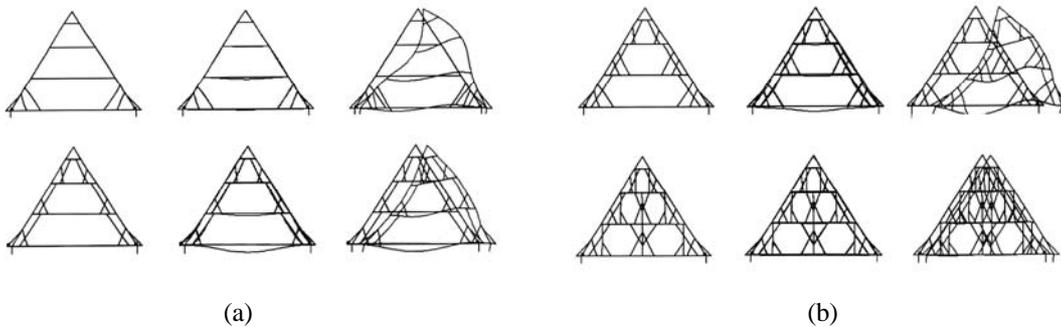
Deformations in the Gothic roof structures on common rafters and tie-beams with collar beams, at (a) symmetrical, (b) non-symmetrical actions
